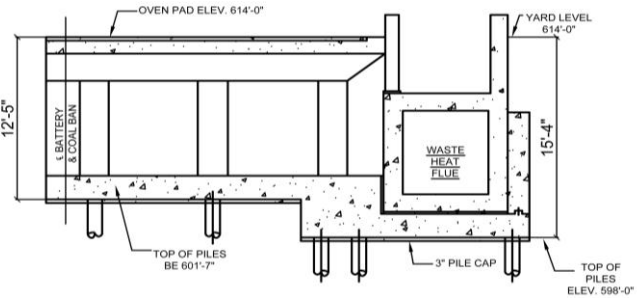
Section BB – Pile Top Elevations under Coke Ovens
